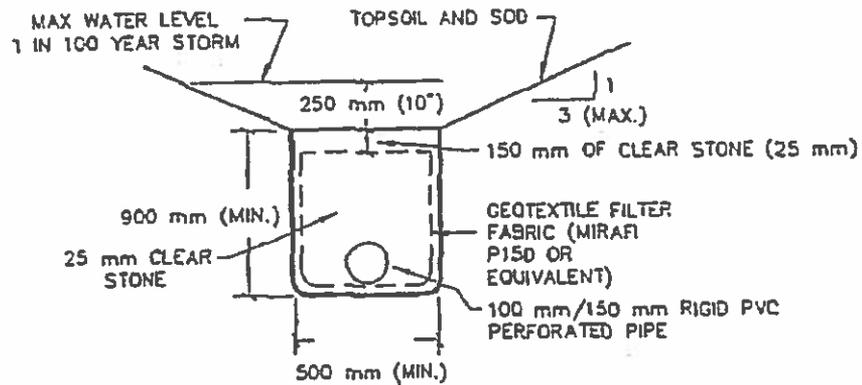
SWALE AND UNDERDRAIN CROSS SECTION
